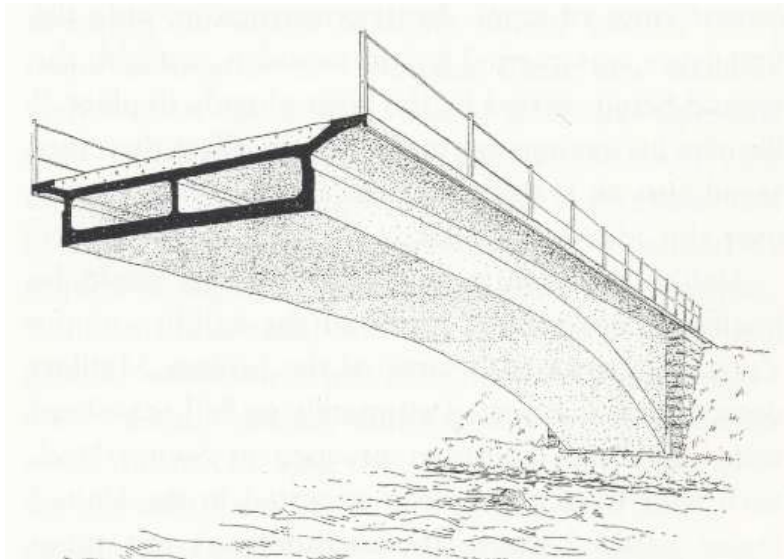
Cross-section of the Zuoz Bridge [1]
